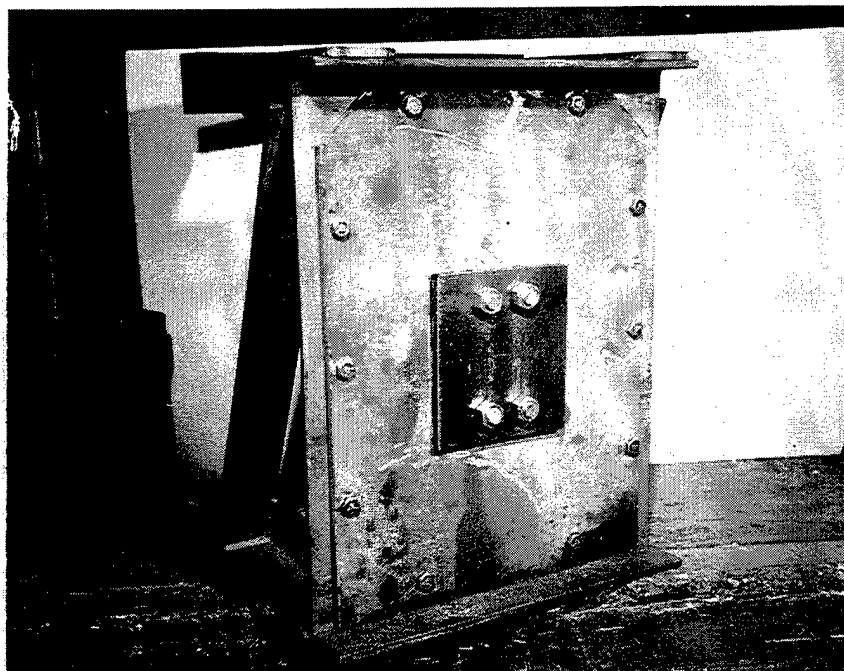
Back view of the test jig showing the 1/2-in-thick steel plate of the new lifting device bolted to the back side of the aluminum girder test plate, which in turn is bolted to the test jig.
